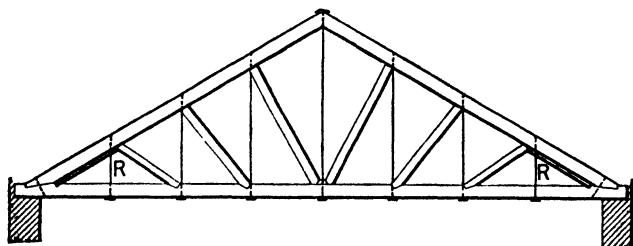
Eight-panel Triangular Howe Truss Spans from Forty-eight to Sixty Feet
